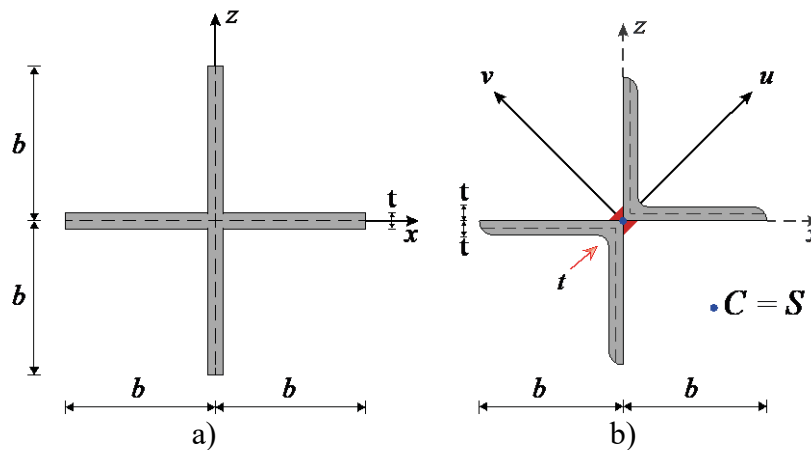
a) Symmetrical plain cruciform cross-section and b) dual equal-leg angle welded cross-section.
